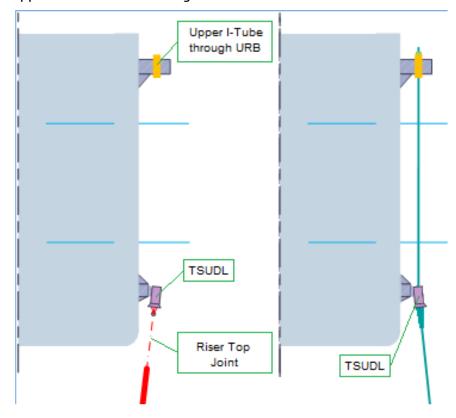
Riser Support Tube Assembly (TSUDL & Upper I-Tube) (Illustrative)
